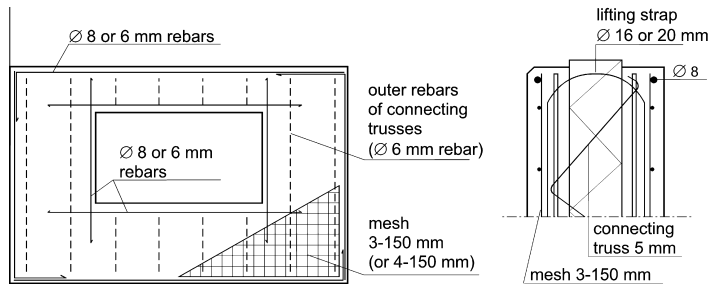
Typical reinforcement of outer layer of a concrete facade panel [34].
